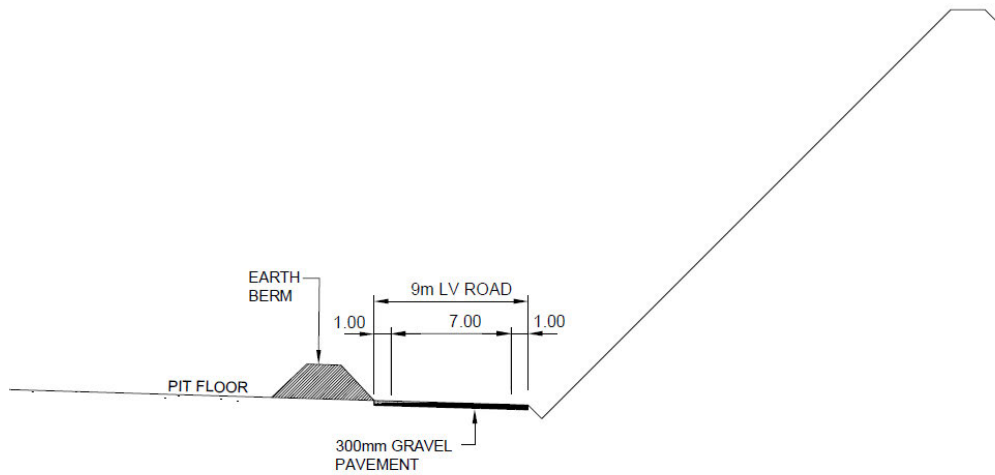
Section view – Separation of HV and LV - Pit floor
